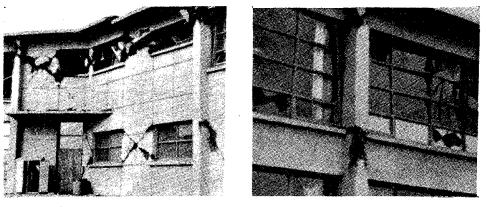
Damage to roof diaphragm near junction of two wings, West Anchorage High School, 1964 Alaska earthquake.
